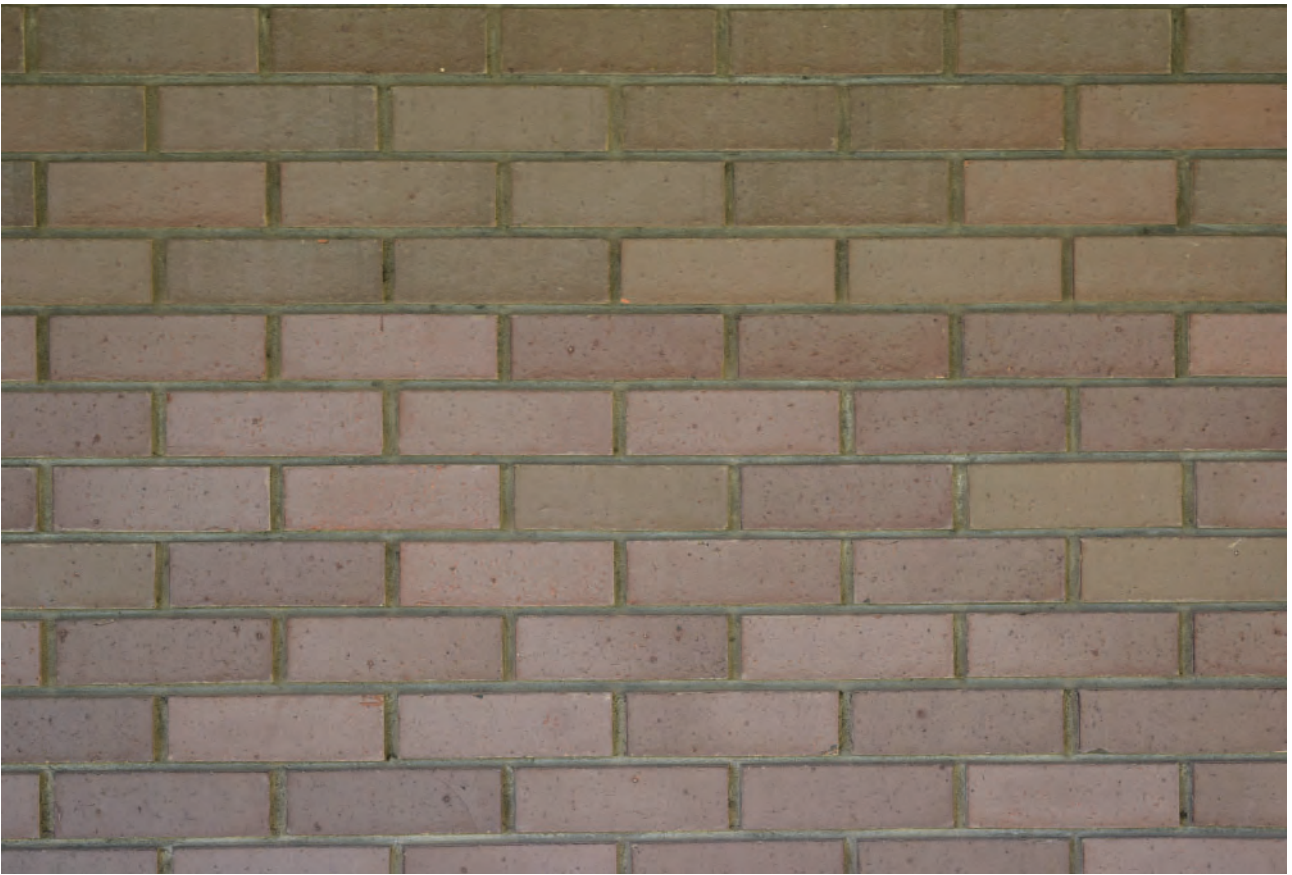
Example of an exterior brick wall, east elevation, looking west.
